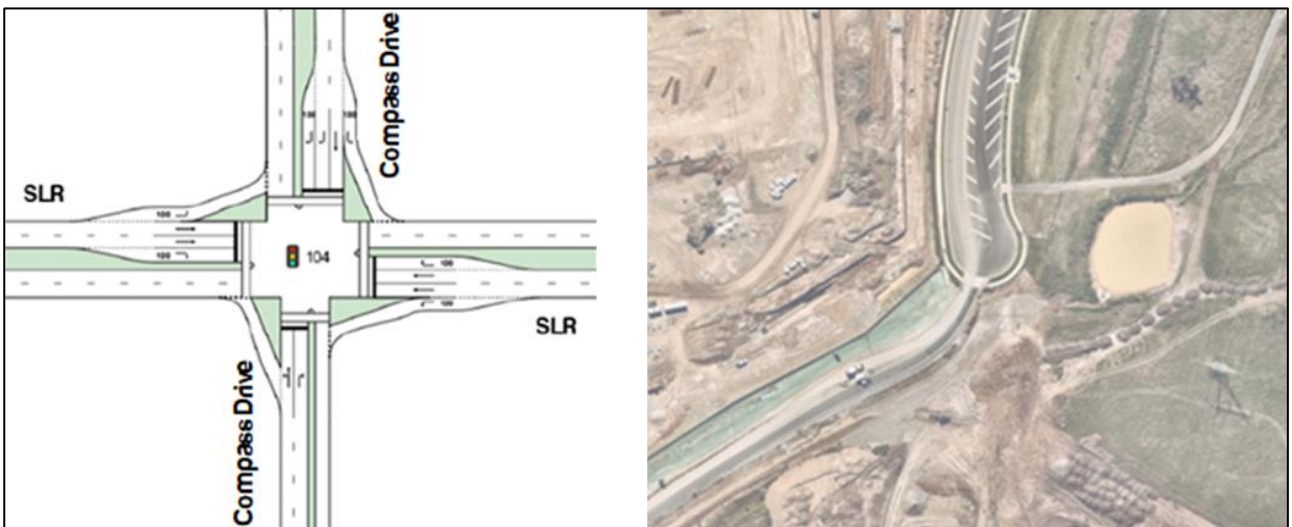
Potential Intersection Layout of Compass Drive & SLR (2021 configuration)
